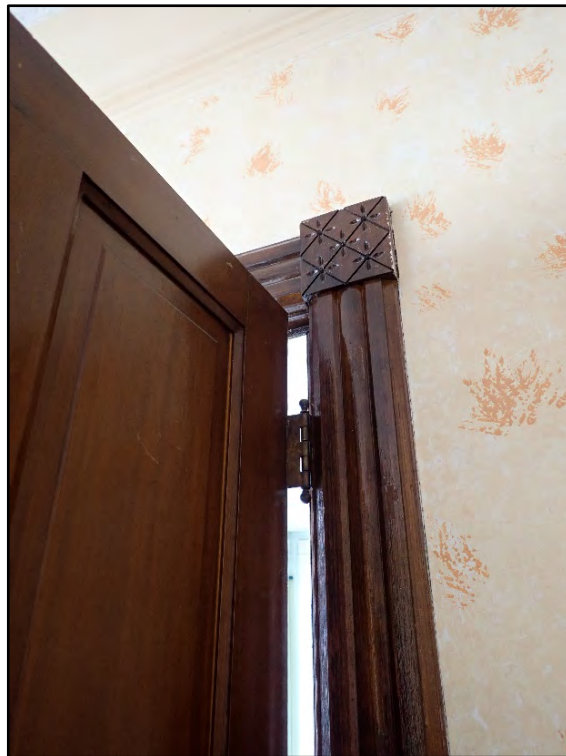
Detail of the casings and corner block of the door to the dining room.
